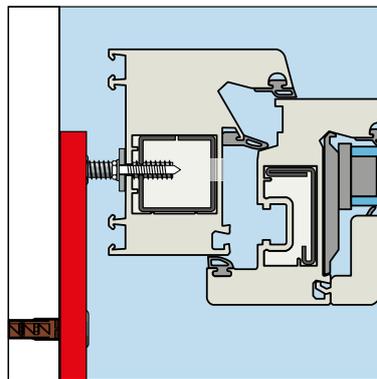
System with national technical approval of anchor, window mounting bracket and screws to fix the window frame to the anchorage substrate for fall-protection glazing Bild 7. Allgemein bauaufsichtlich zugelassenes System aus Dübel, Fenstermontagekonsole und Schraube zur Verbindung von Fensterrahmen mit dem Verankerungsgrund bei einer abzusichernden Verglasung
